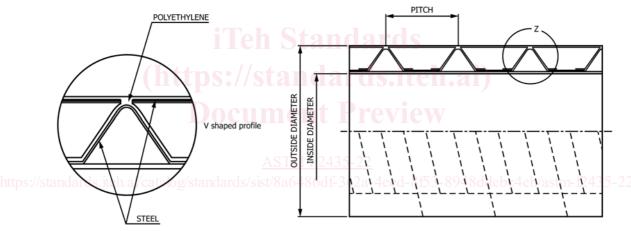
Triple-Wall Steel Reinforced Corrugated Polyethylene Pipe – Type IIA
